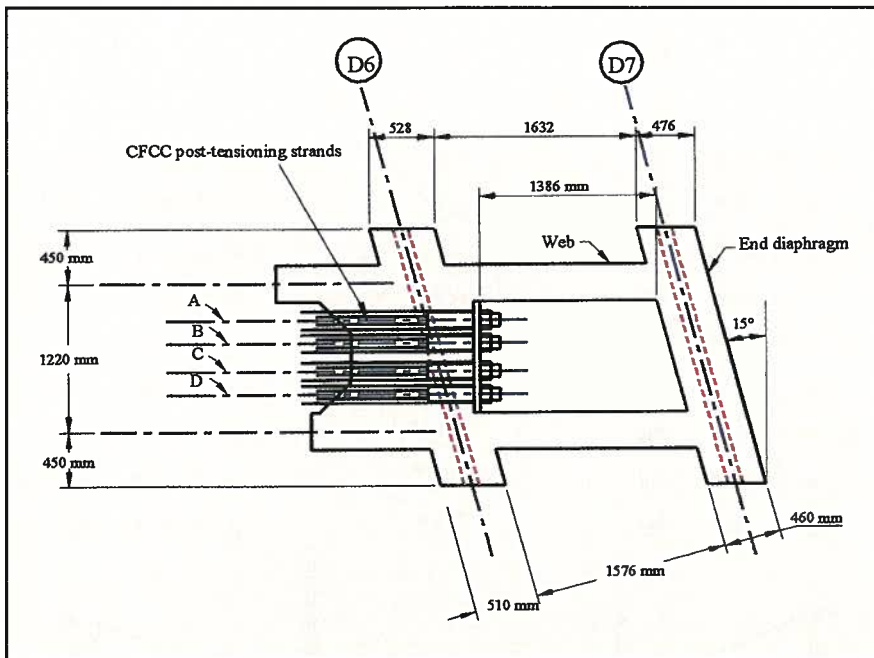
Post-tensioning anchorage details at Diaphragm D6.
